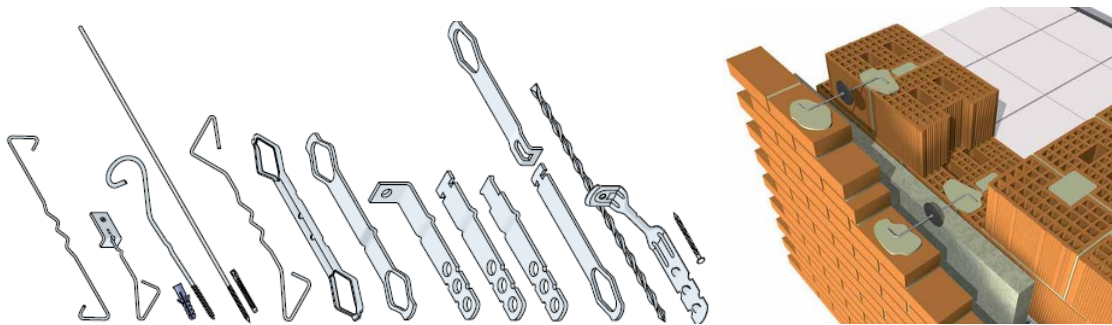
Examples of wire and corrugated ties when masonry veneer walls are attached to masonry or concrete walls [33]
